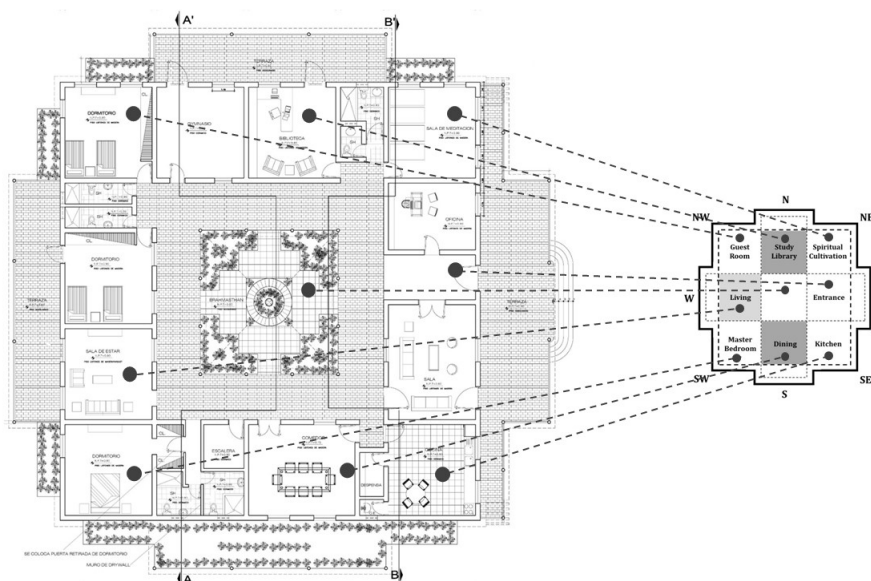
House No. 1 floor plan in relation to the indicative floor plan of an MVA home
